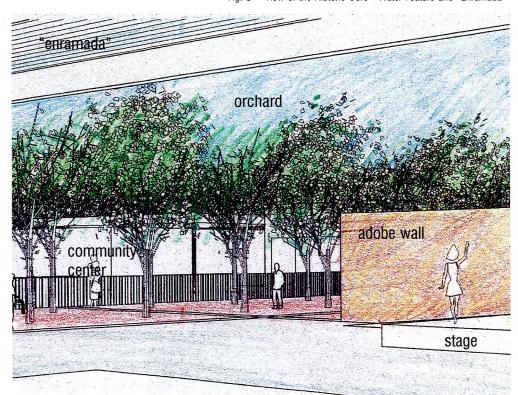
View of Stage and Adobe Wall from under "Enramada"
